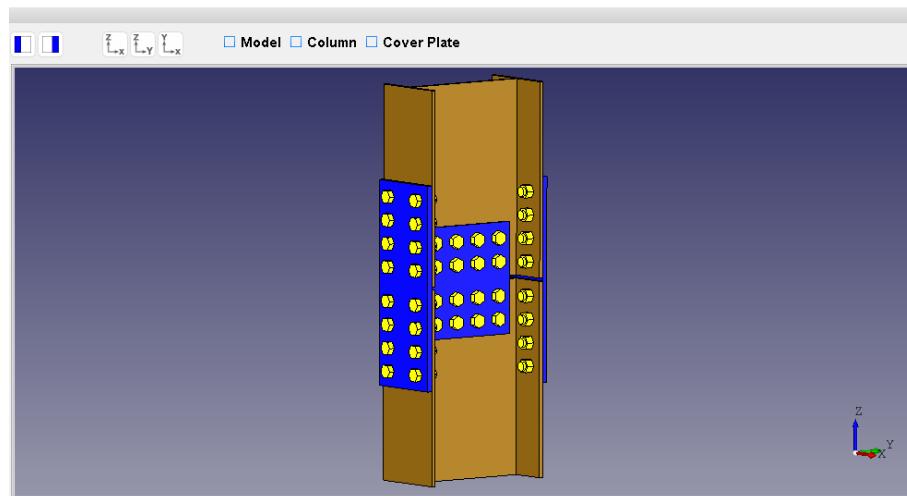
3D drawing output of typical Column to Column Cover plate connection
